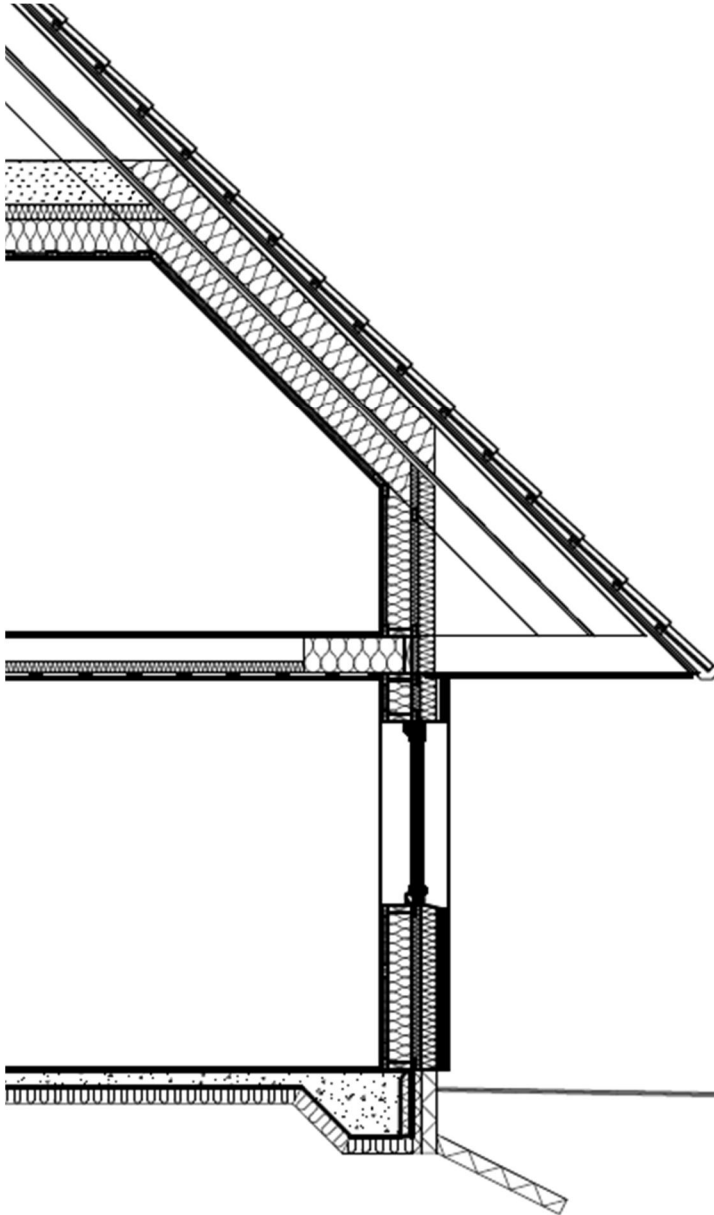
Section drawing of RH2 after renovation with Passive House renovation package.
